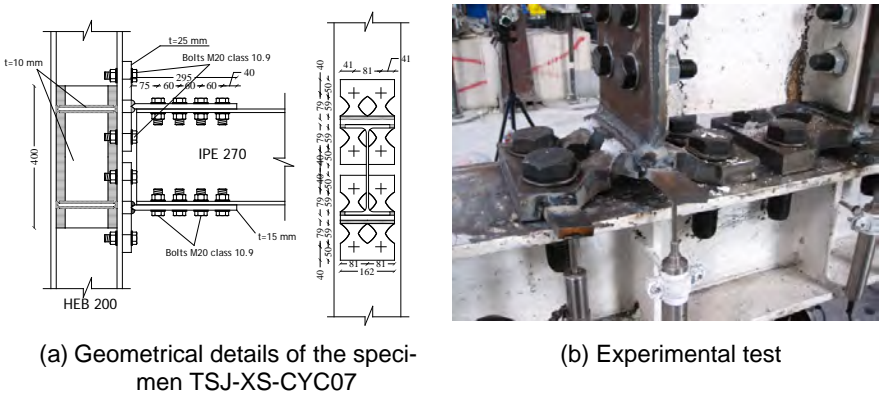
Geometrical details and experimental test of dissipative DSTC with hourglass T-stub flanges
